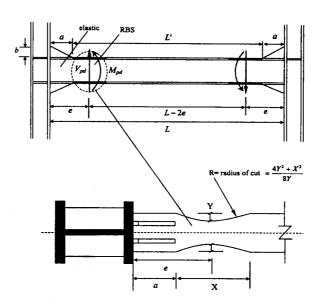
Typical Beam Span with Rib Connection Supplemented by Radius-Cut RBS
